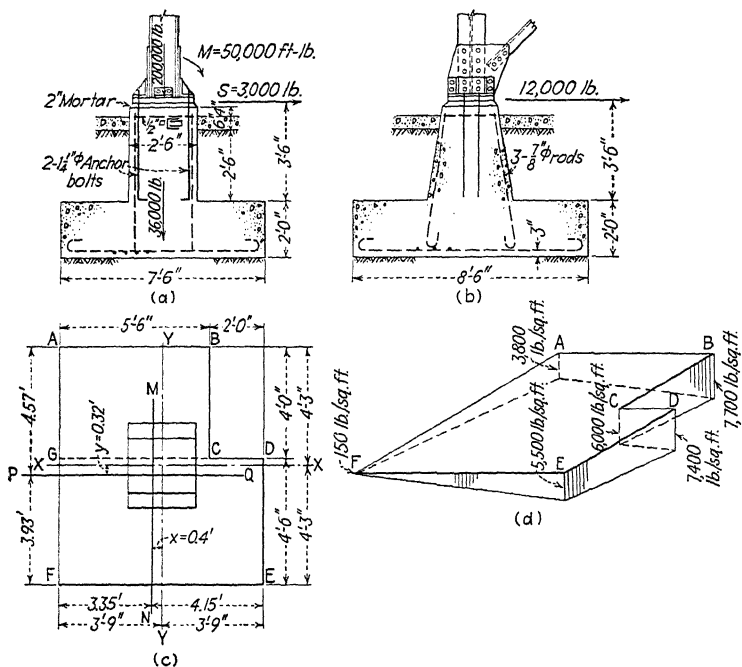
Unsymmetrical footing for steel column in industrial plant.
